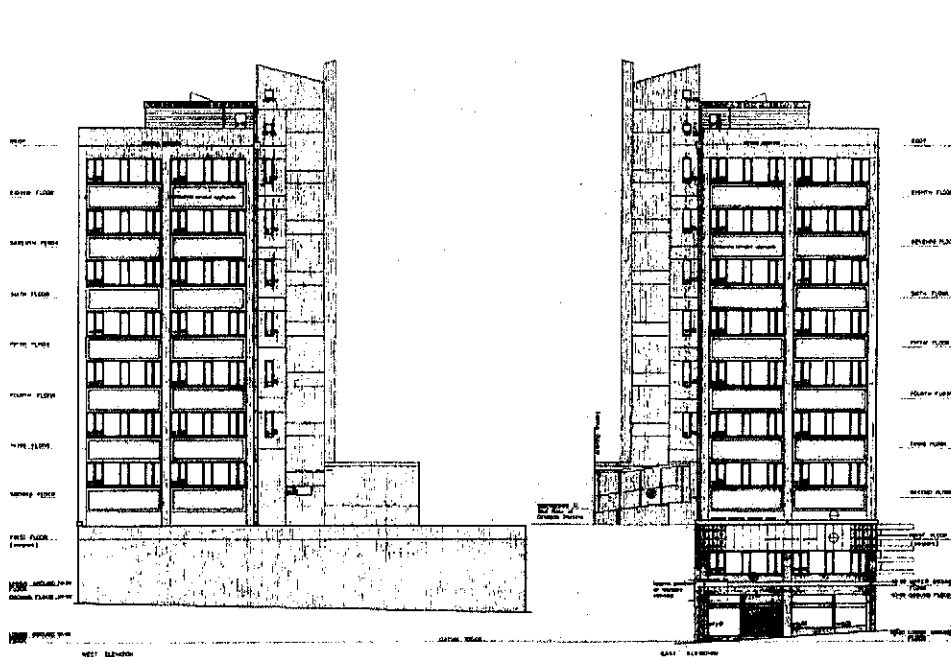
East and West Elevations of Forsyth Barr House from the Architectural drawings showing shear wall stairwell structure relative to the moment frame main office block.
